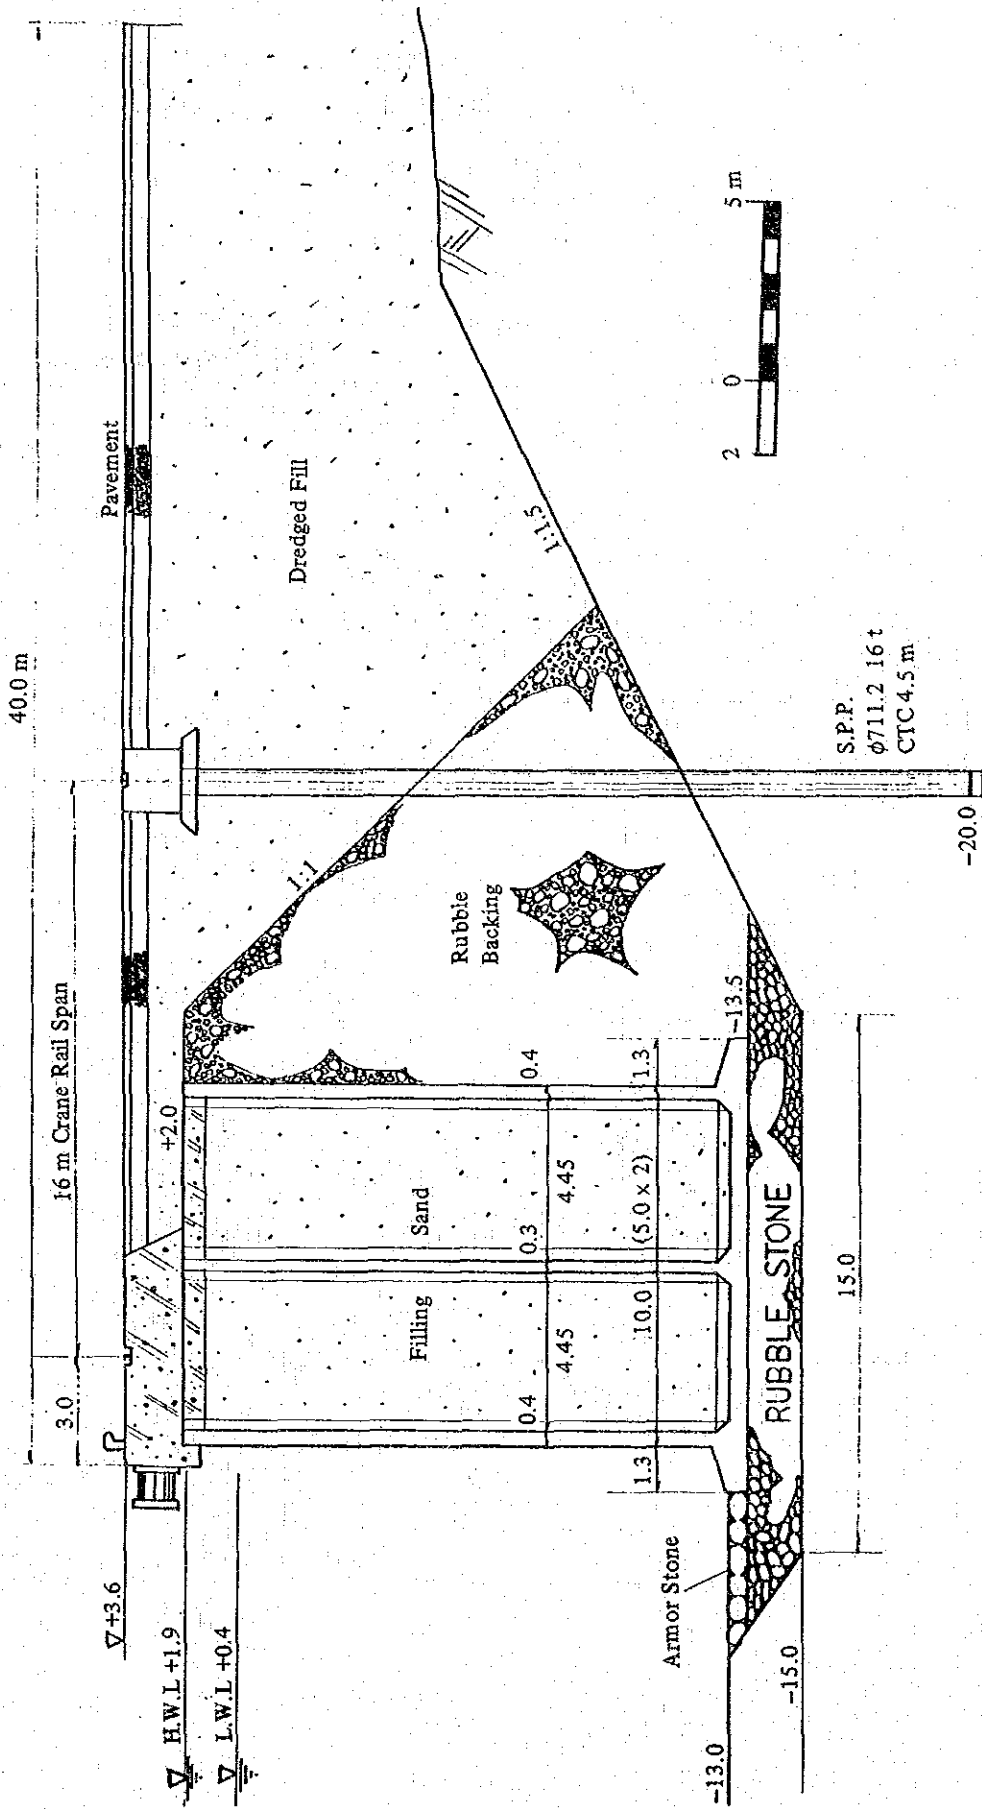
Section of Concrete Caisson for Quaywall
